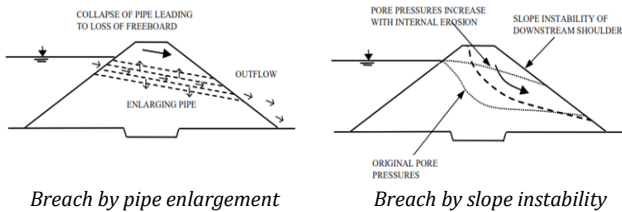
Potential breach (failure) phenomena-pipe enlargement and slope instability, [4].
